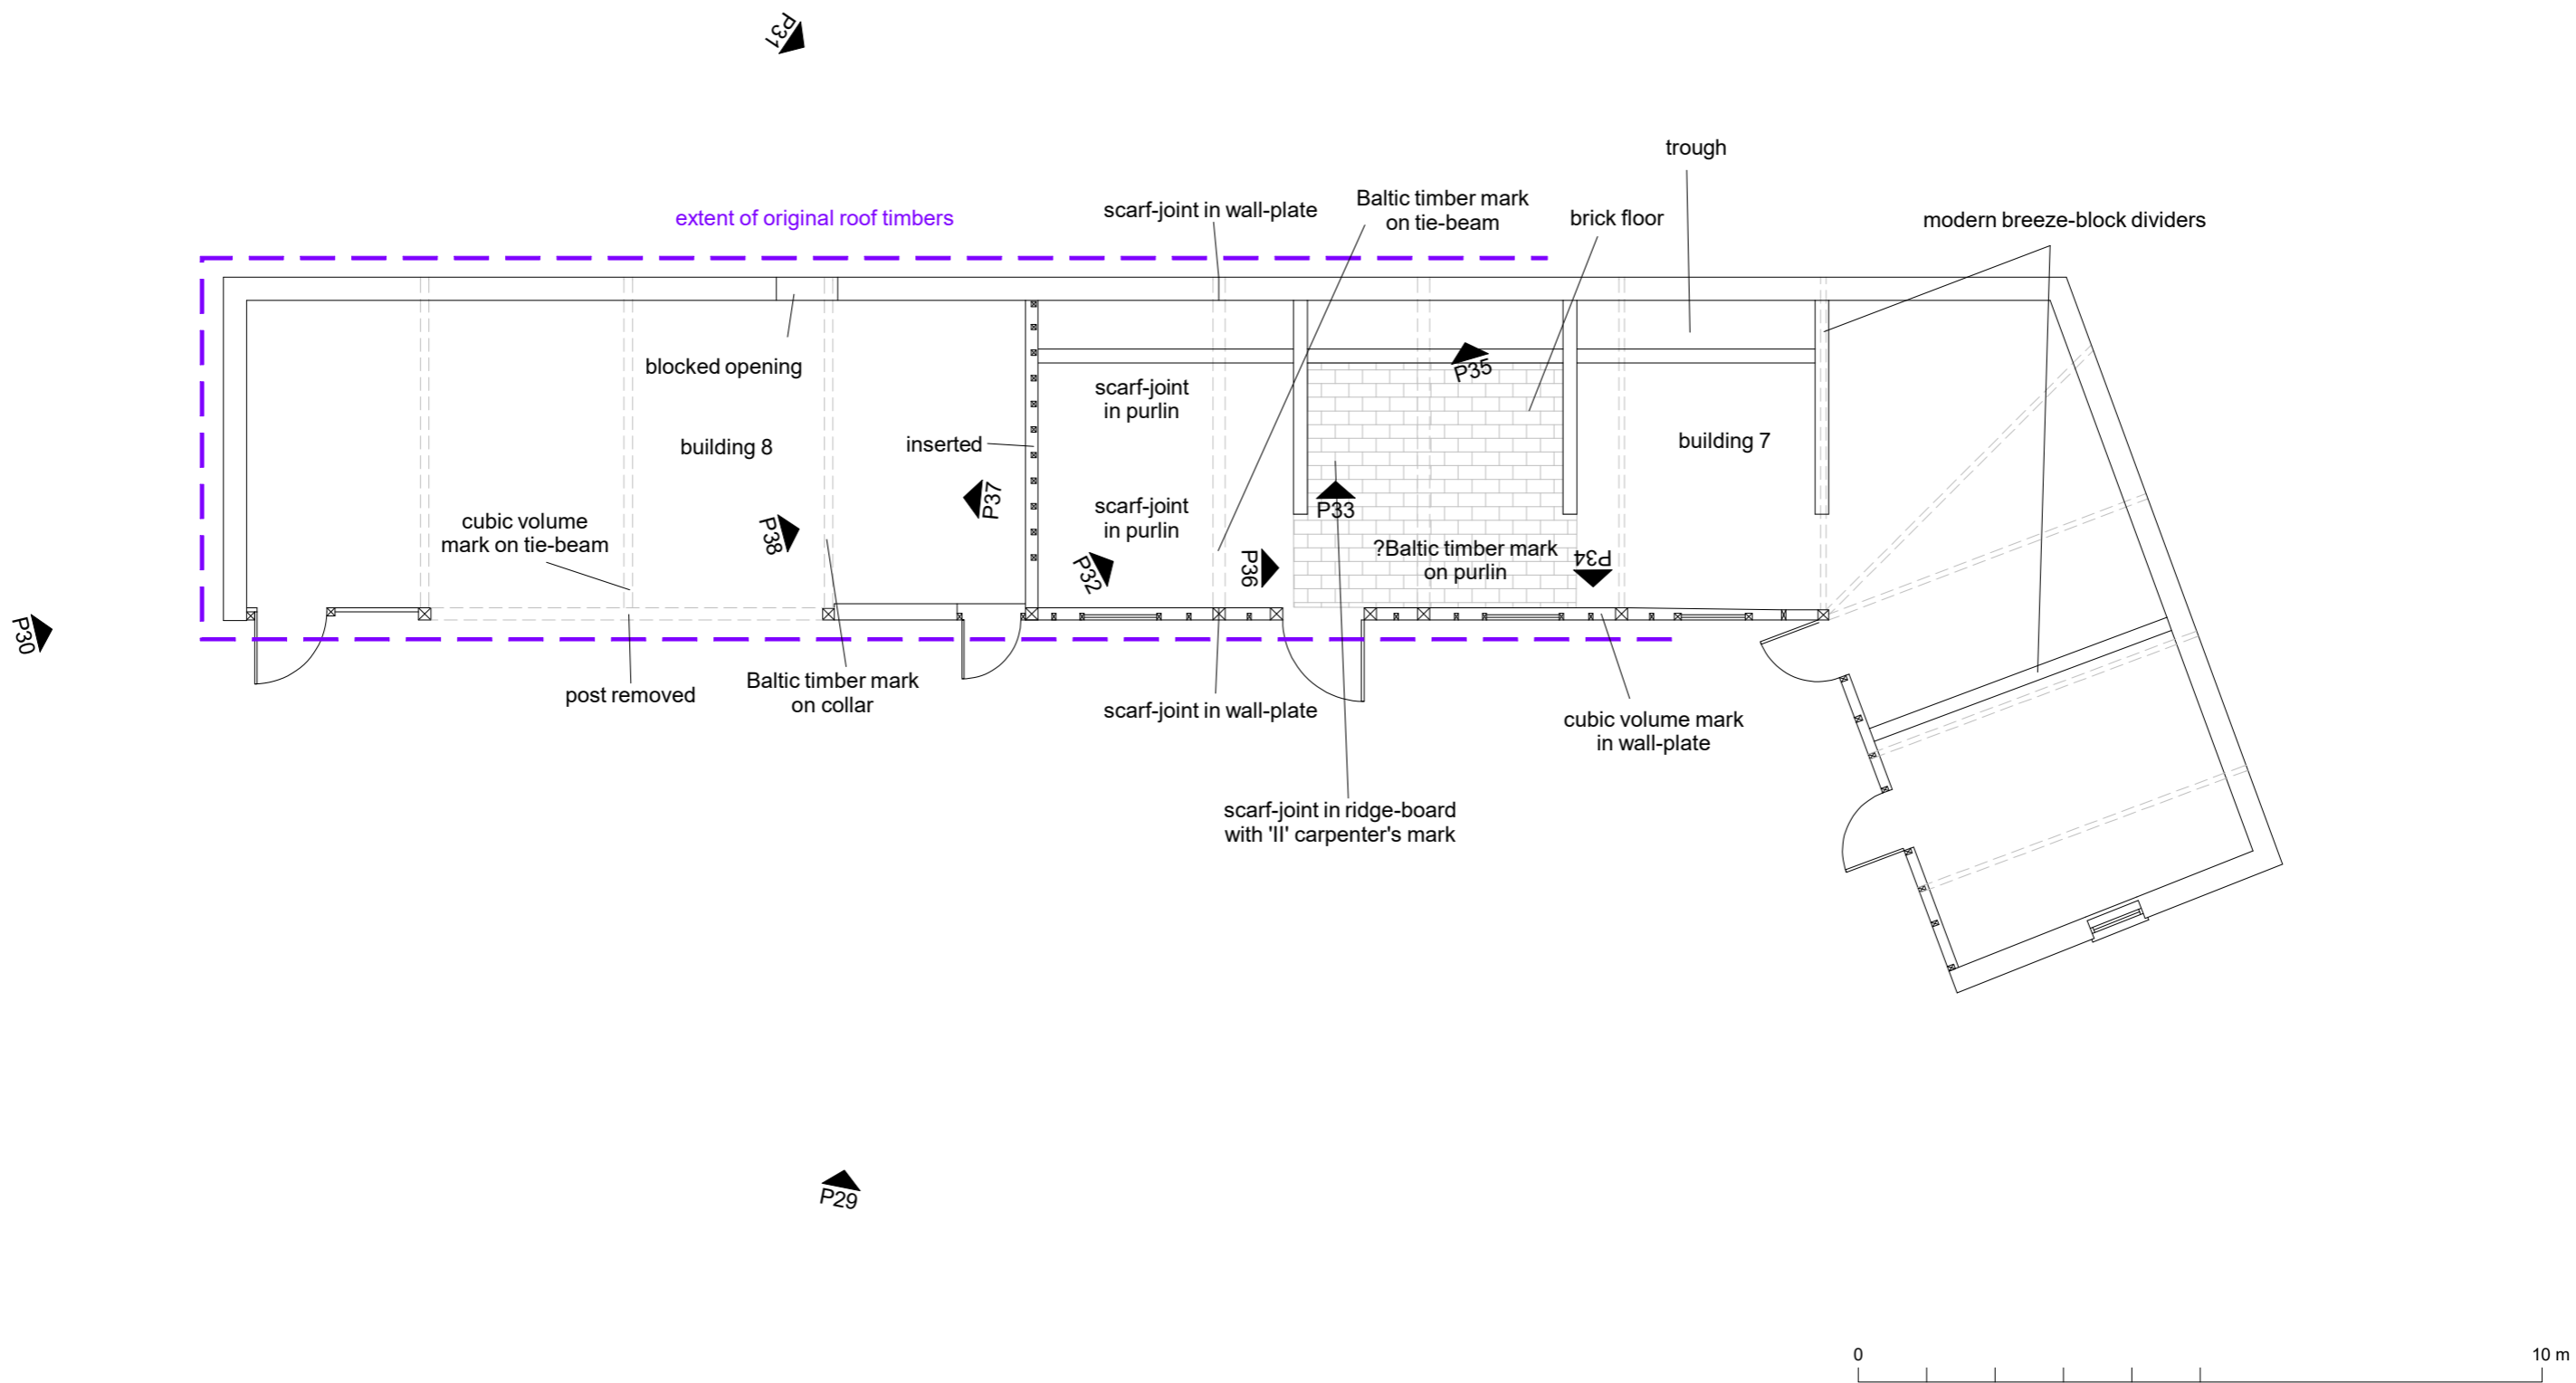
Pond Barn floor plan. Location and direction of photographs reproduced in the text shown.
